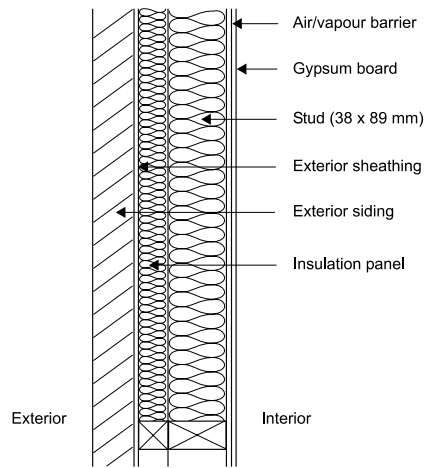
Vertical wall section showing insulation panel installed on outside of stud wall
